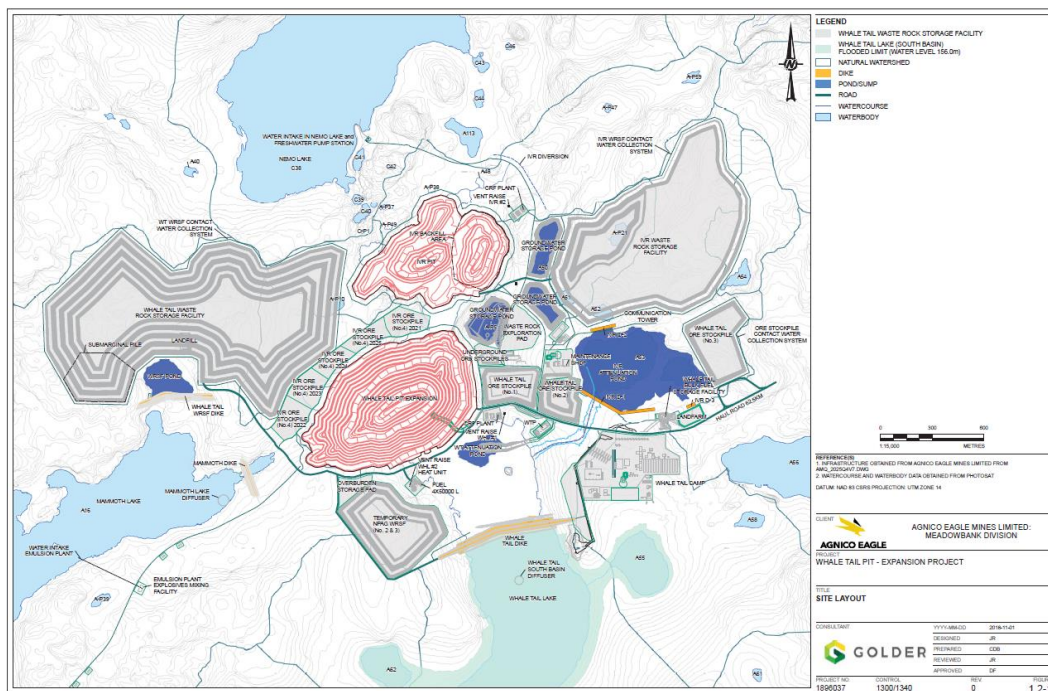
Site Layout – Whale Tail Pit Expansion Proposal⁵
